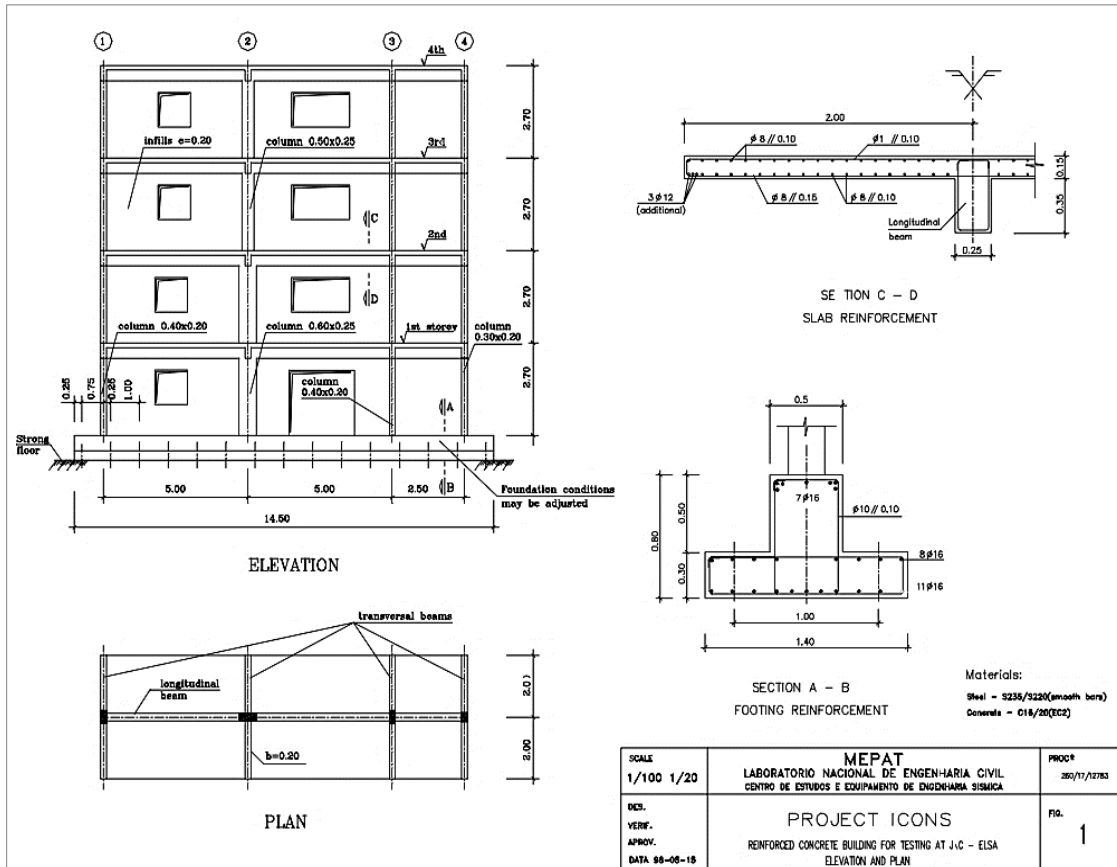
Four-story, three-bay RC frame geometry (m), (elevation and plan views [12])
